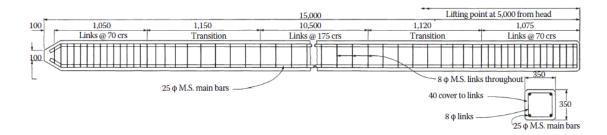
Typical solution for prefabricated reinforced concrete pile [1]
